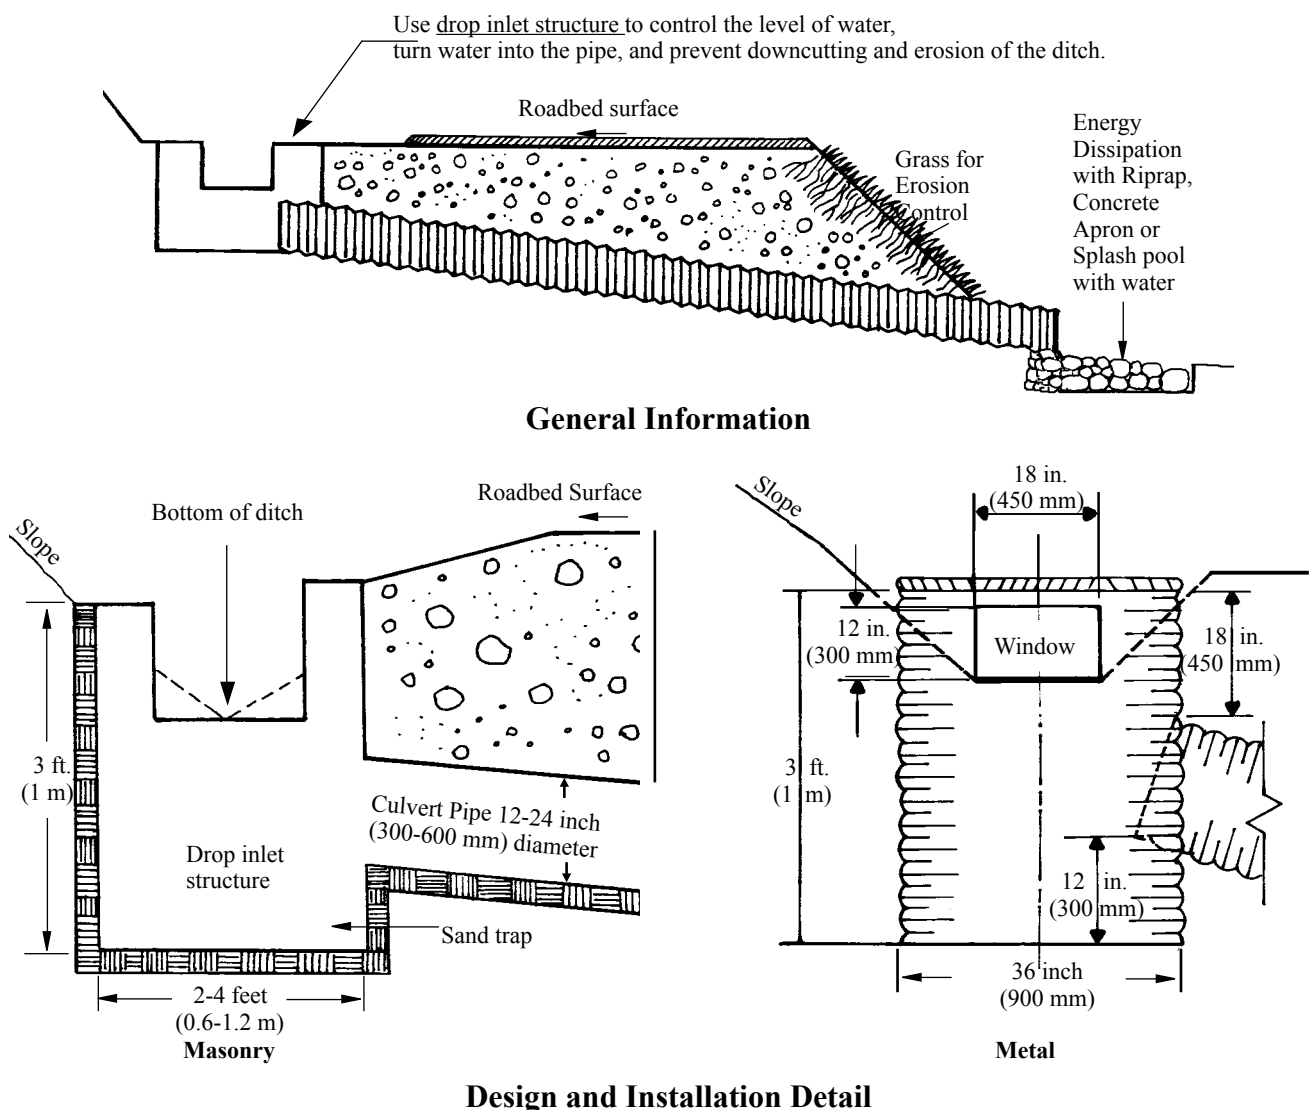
Drop inlet design and installation details for concrete box or corrugated metal riser pipe with built-in sand traps.
